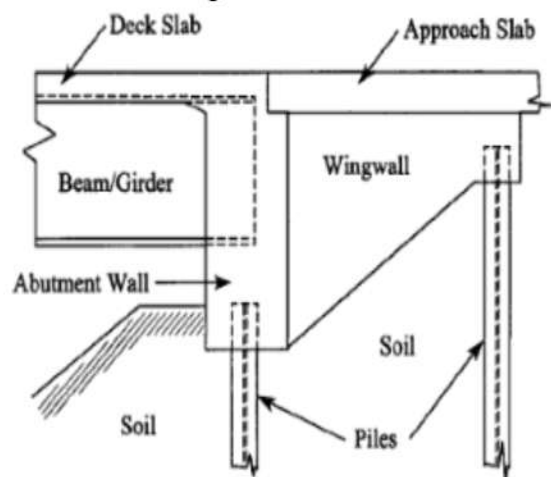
Connection Detail for Composite Steel Integral Bridge.
